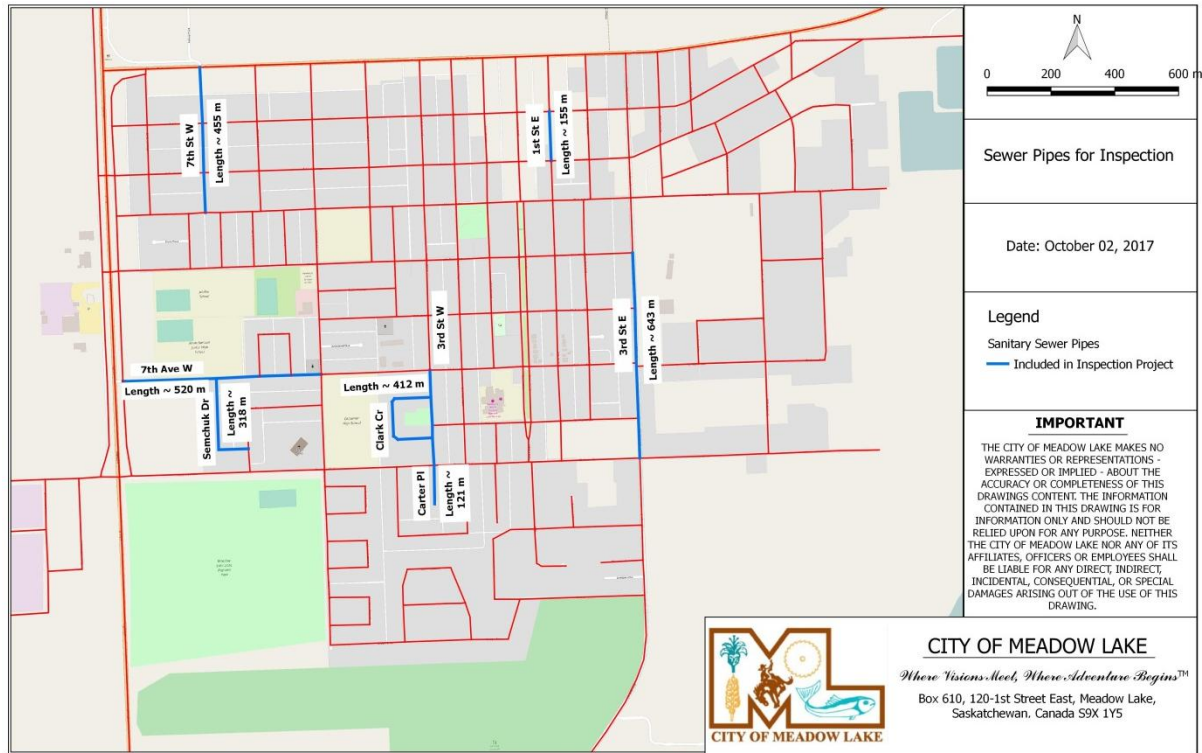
Sanitary sewer pipes planned for inspection
